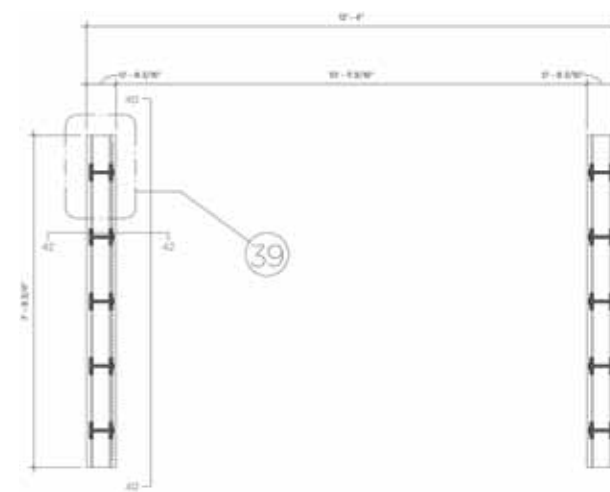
Plan - Custom Moveable Archway System on Recessed Floor Track
